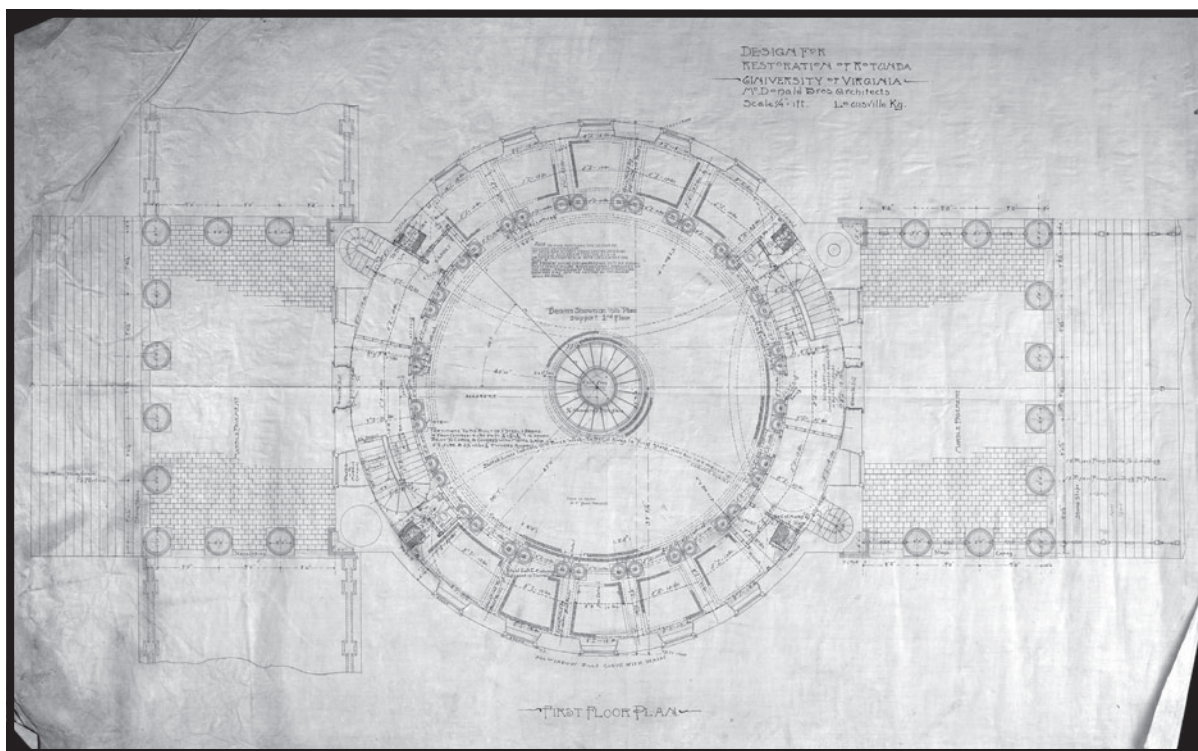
McDonald Brothers, first-floor plan, ca. 1895.
